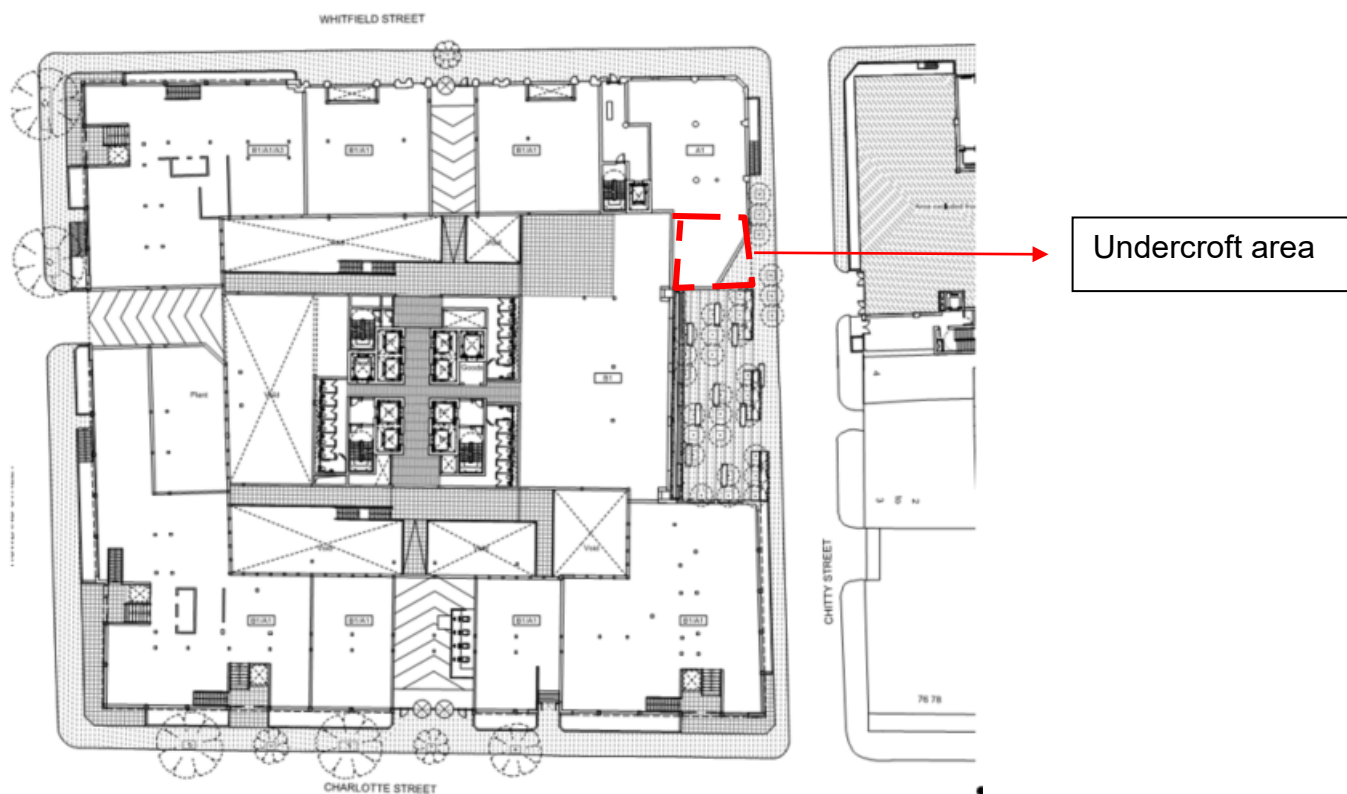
(Above) Ground floor plan approved under planning permission 2010/6873/P for 80 Charlotte Street
